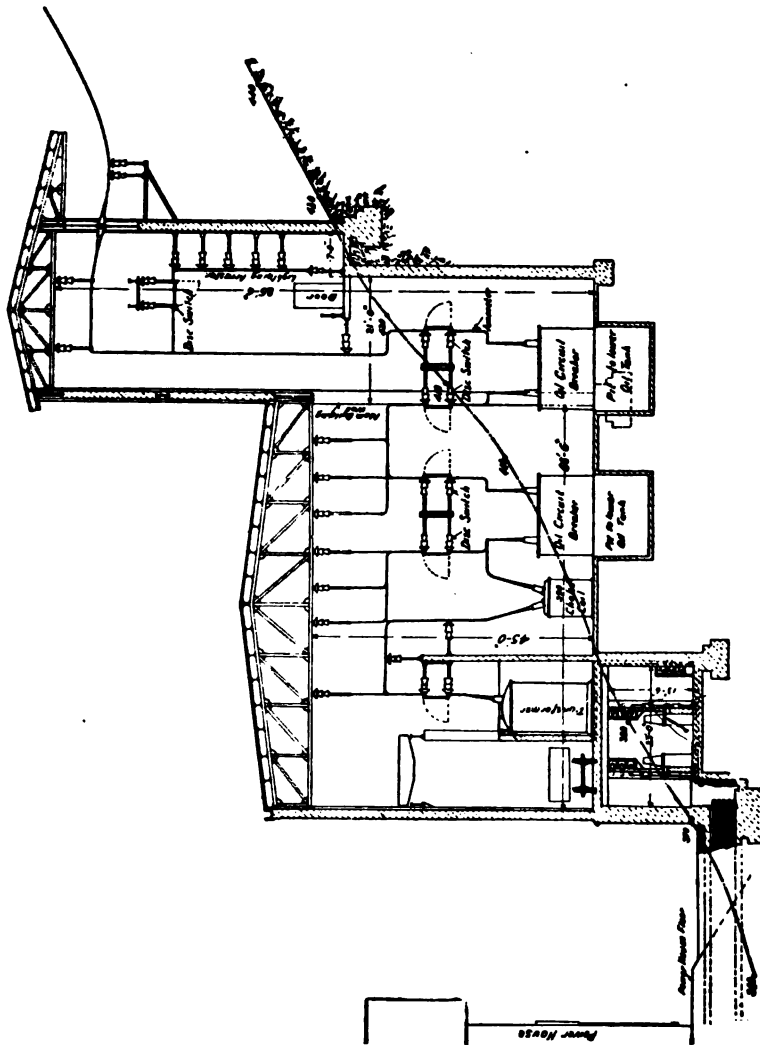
Section of transformer and switching house, 100,000-volt plant
